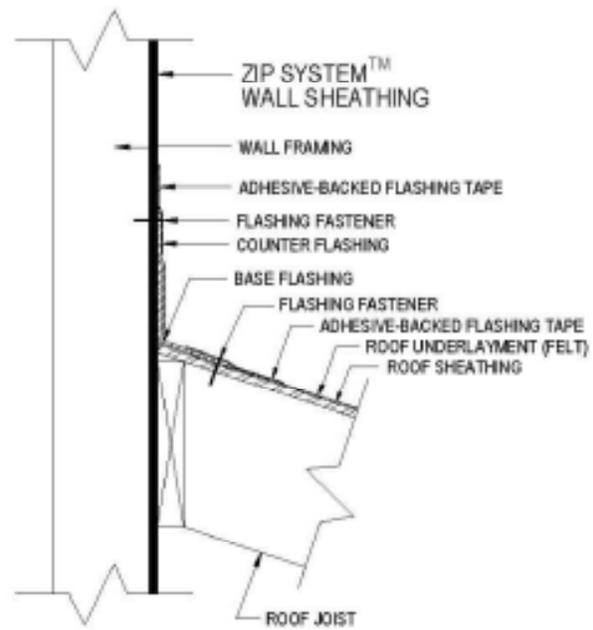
ROOF-WALL INTERSECTION (OPTION 2)
